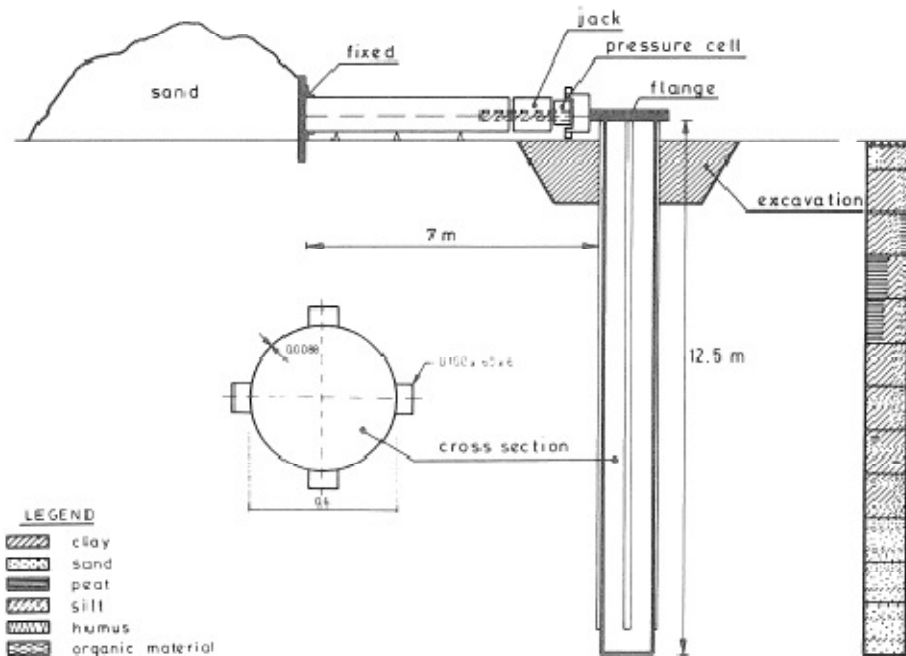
Test setup, soil layers and cross-section pile, Delft
